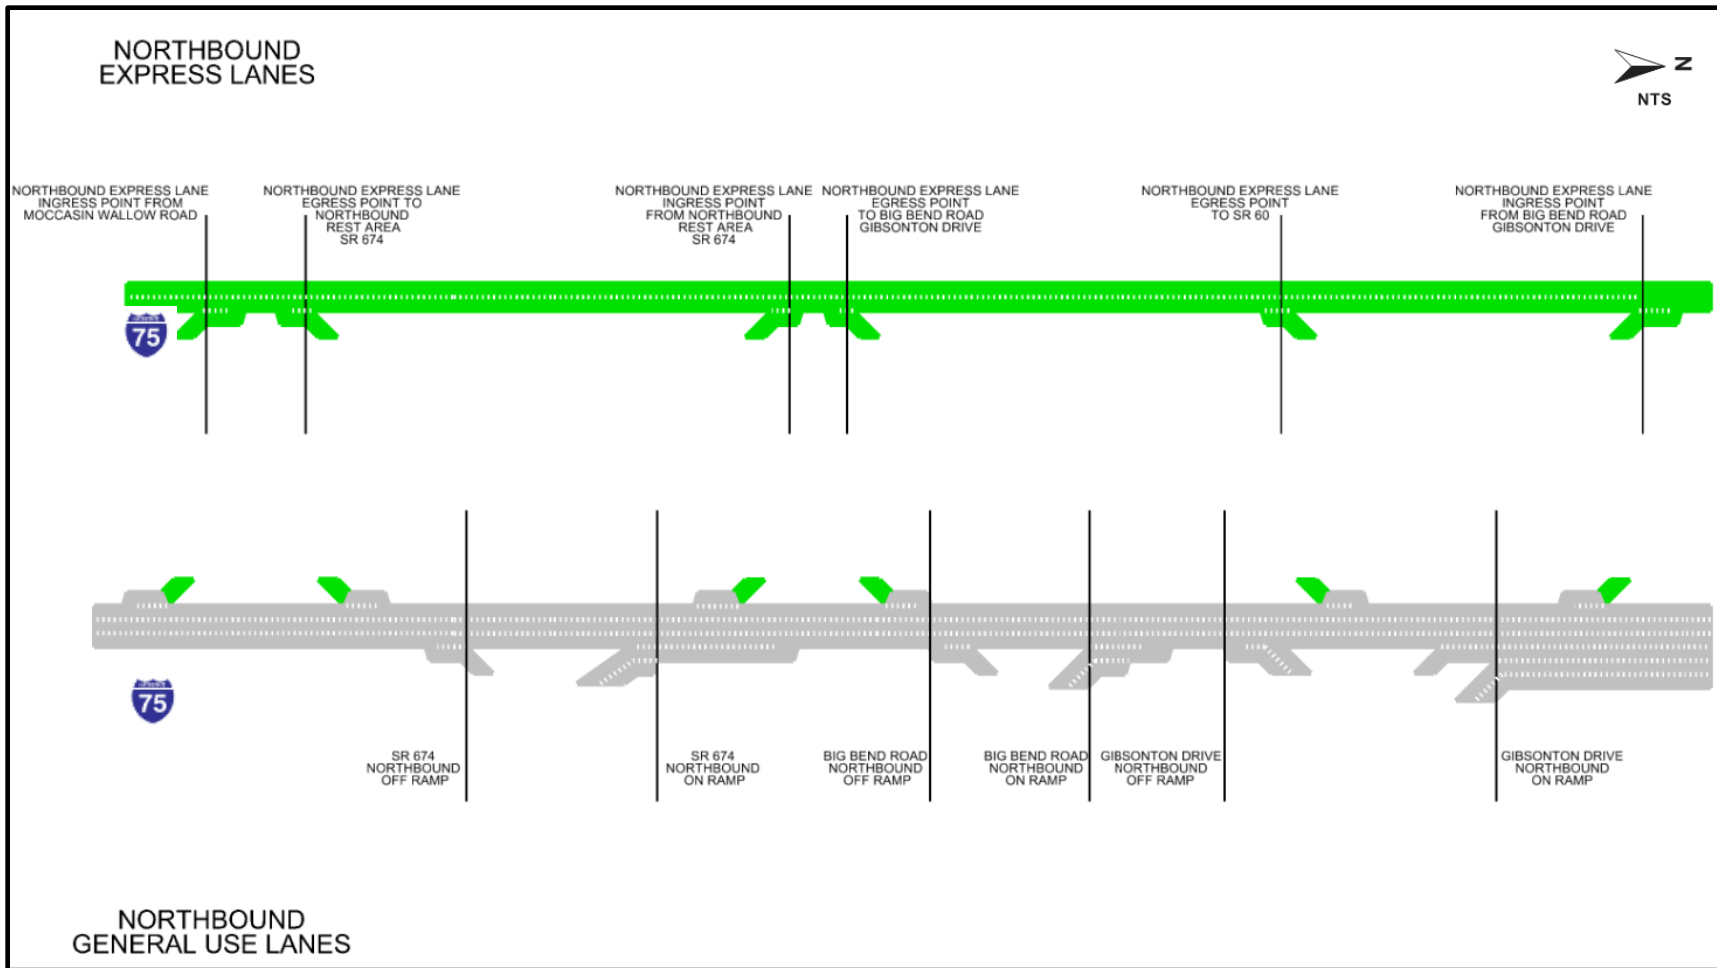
Build Alternative - Northbound I-75 Lane Geometry
